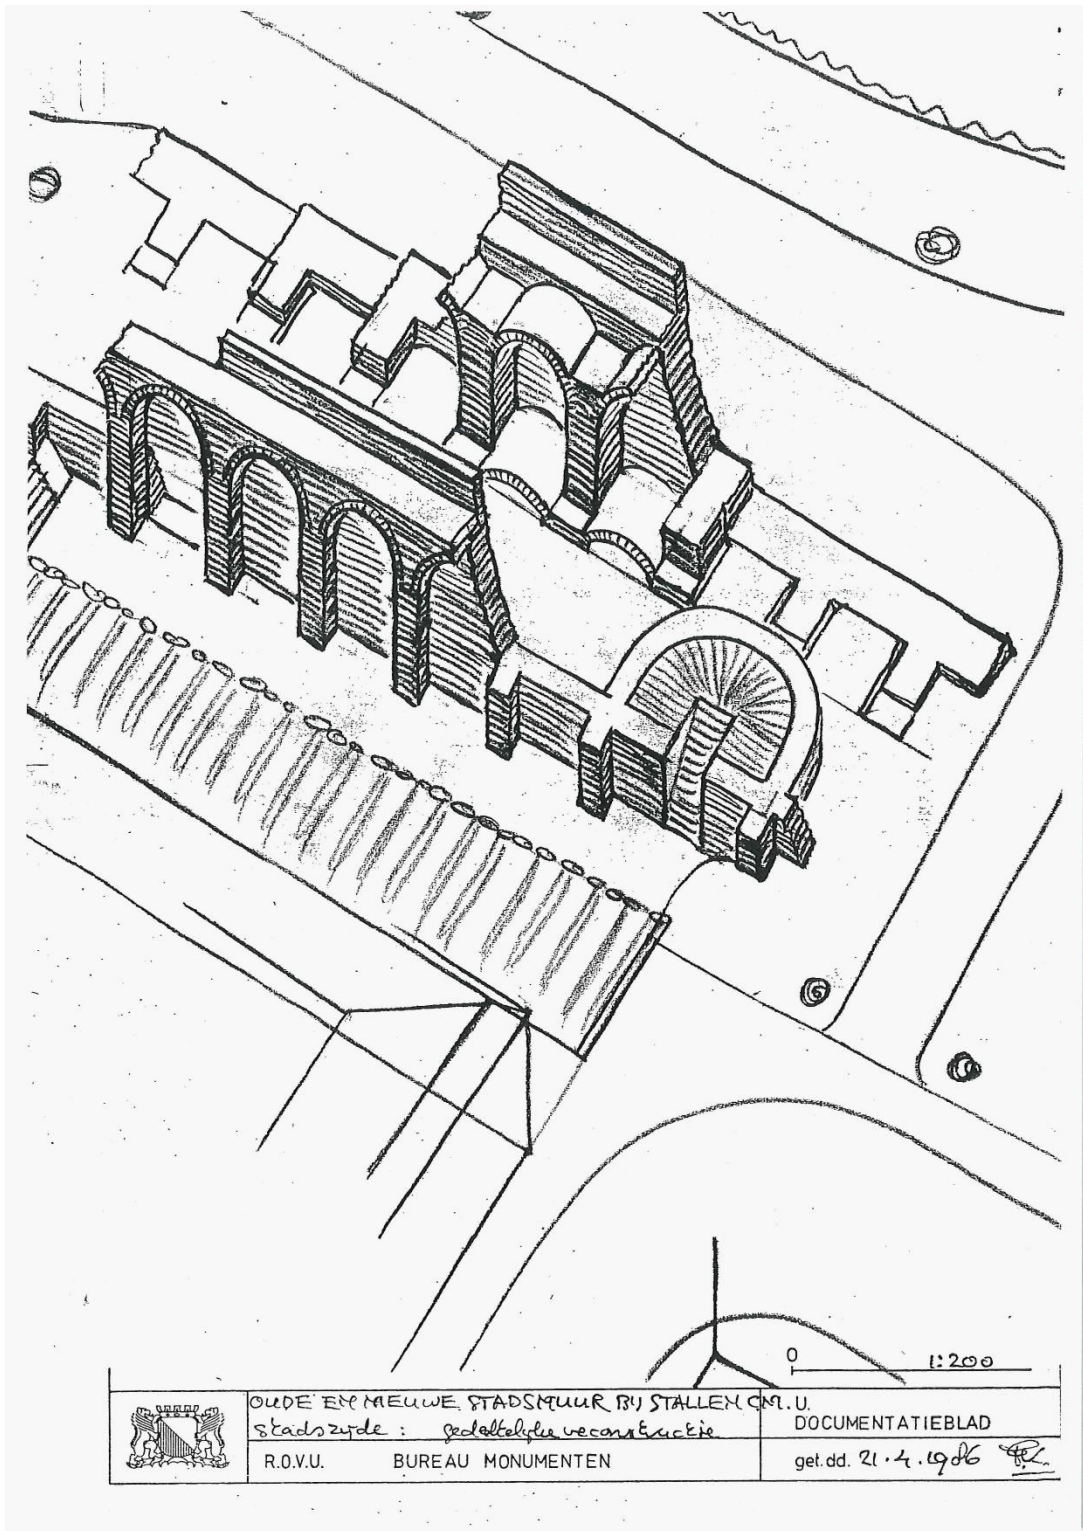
, a reconstruction of the old 14th century town wall (below) containing a tower and the new 16th century (above) town wall. Both are constructed out of a shield wall (solid) and an arch construction on the town's side, by F. Kipp (UD-CM003)
